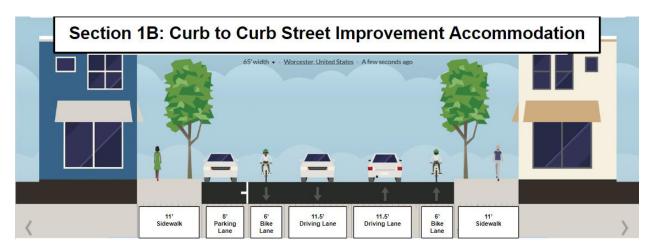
Curb to Curb Street Improvement Accommodation, Section 1B
